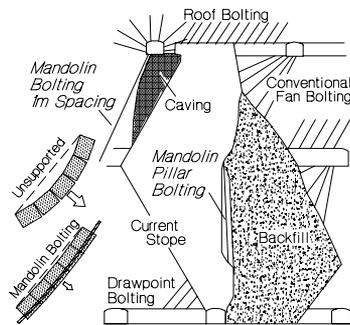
Mandolin bolting in combination with conventional cablebolt patterns (after Lappalainen and Antikainen, 1987)
